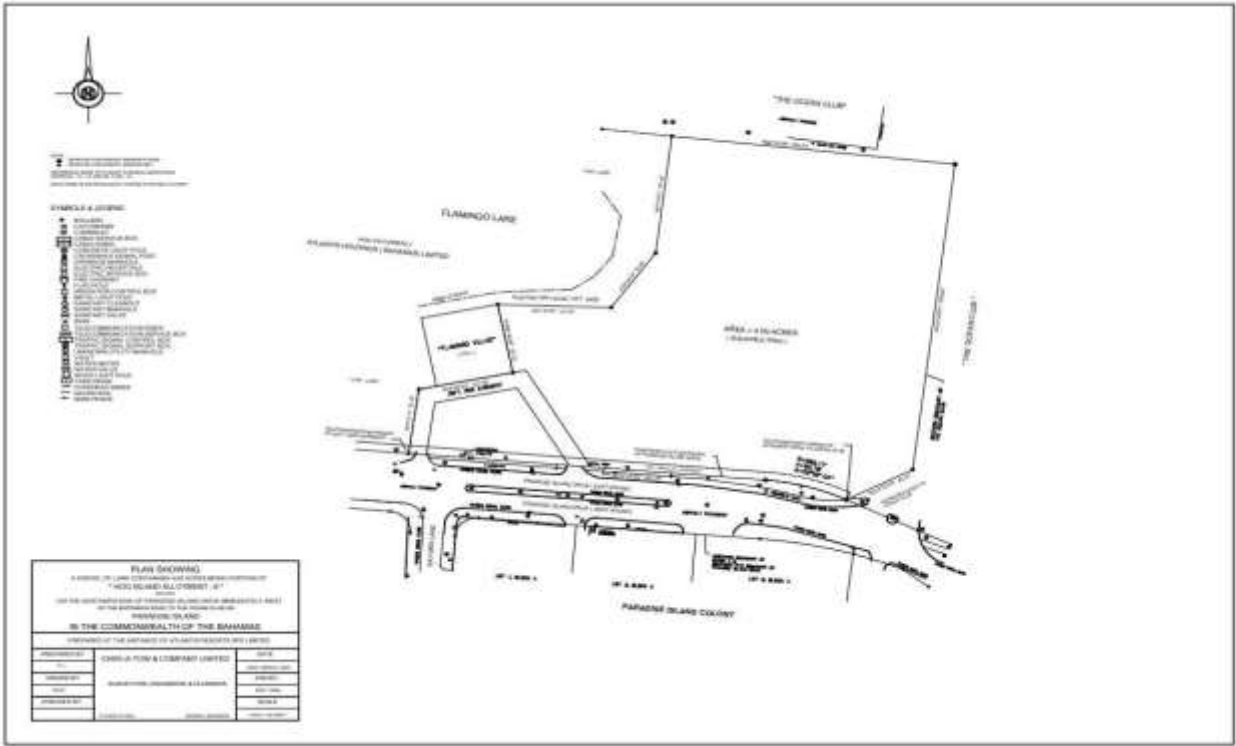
Survey plan depicting site for School Building (4.0 acres)
